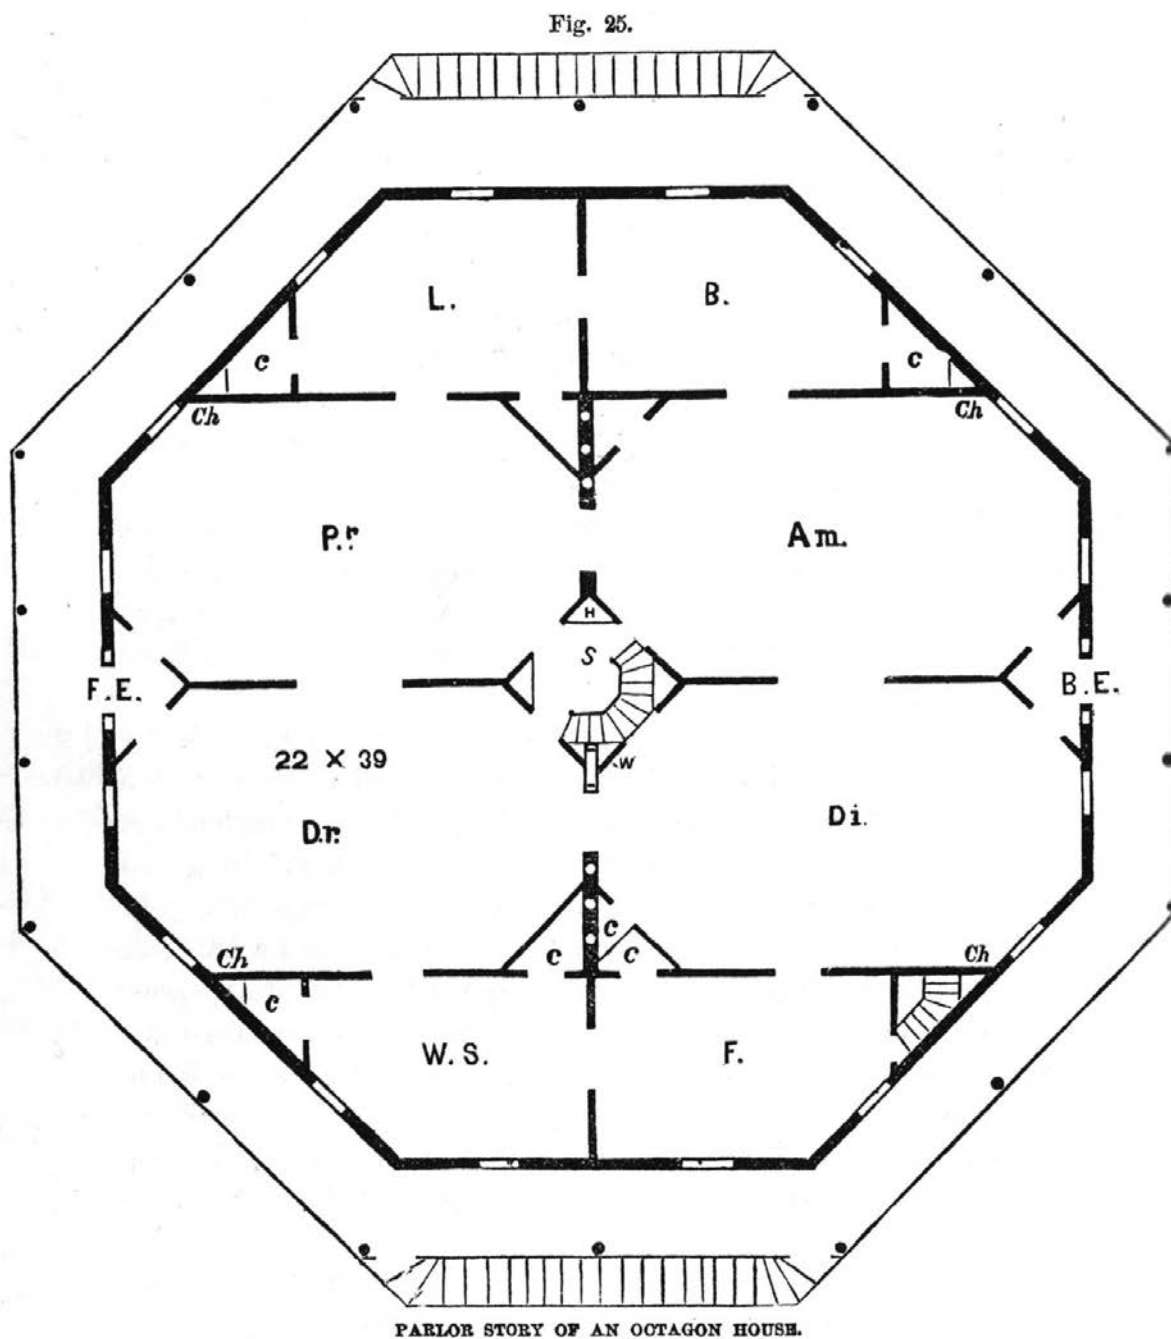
Ground floor plan of the 32-foot octagon house, from *A Home for All* (1853 ed.). Folding doors would allow the parlor, dining room, sitting room, and kitchen to be united into one large space, promoting social gatherings and thereby cultivating humans' natural faculty of "sociality."
